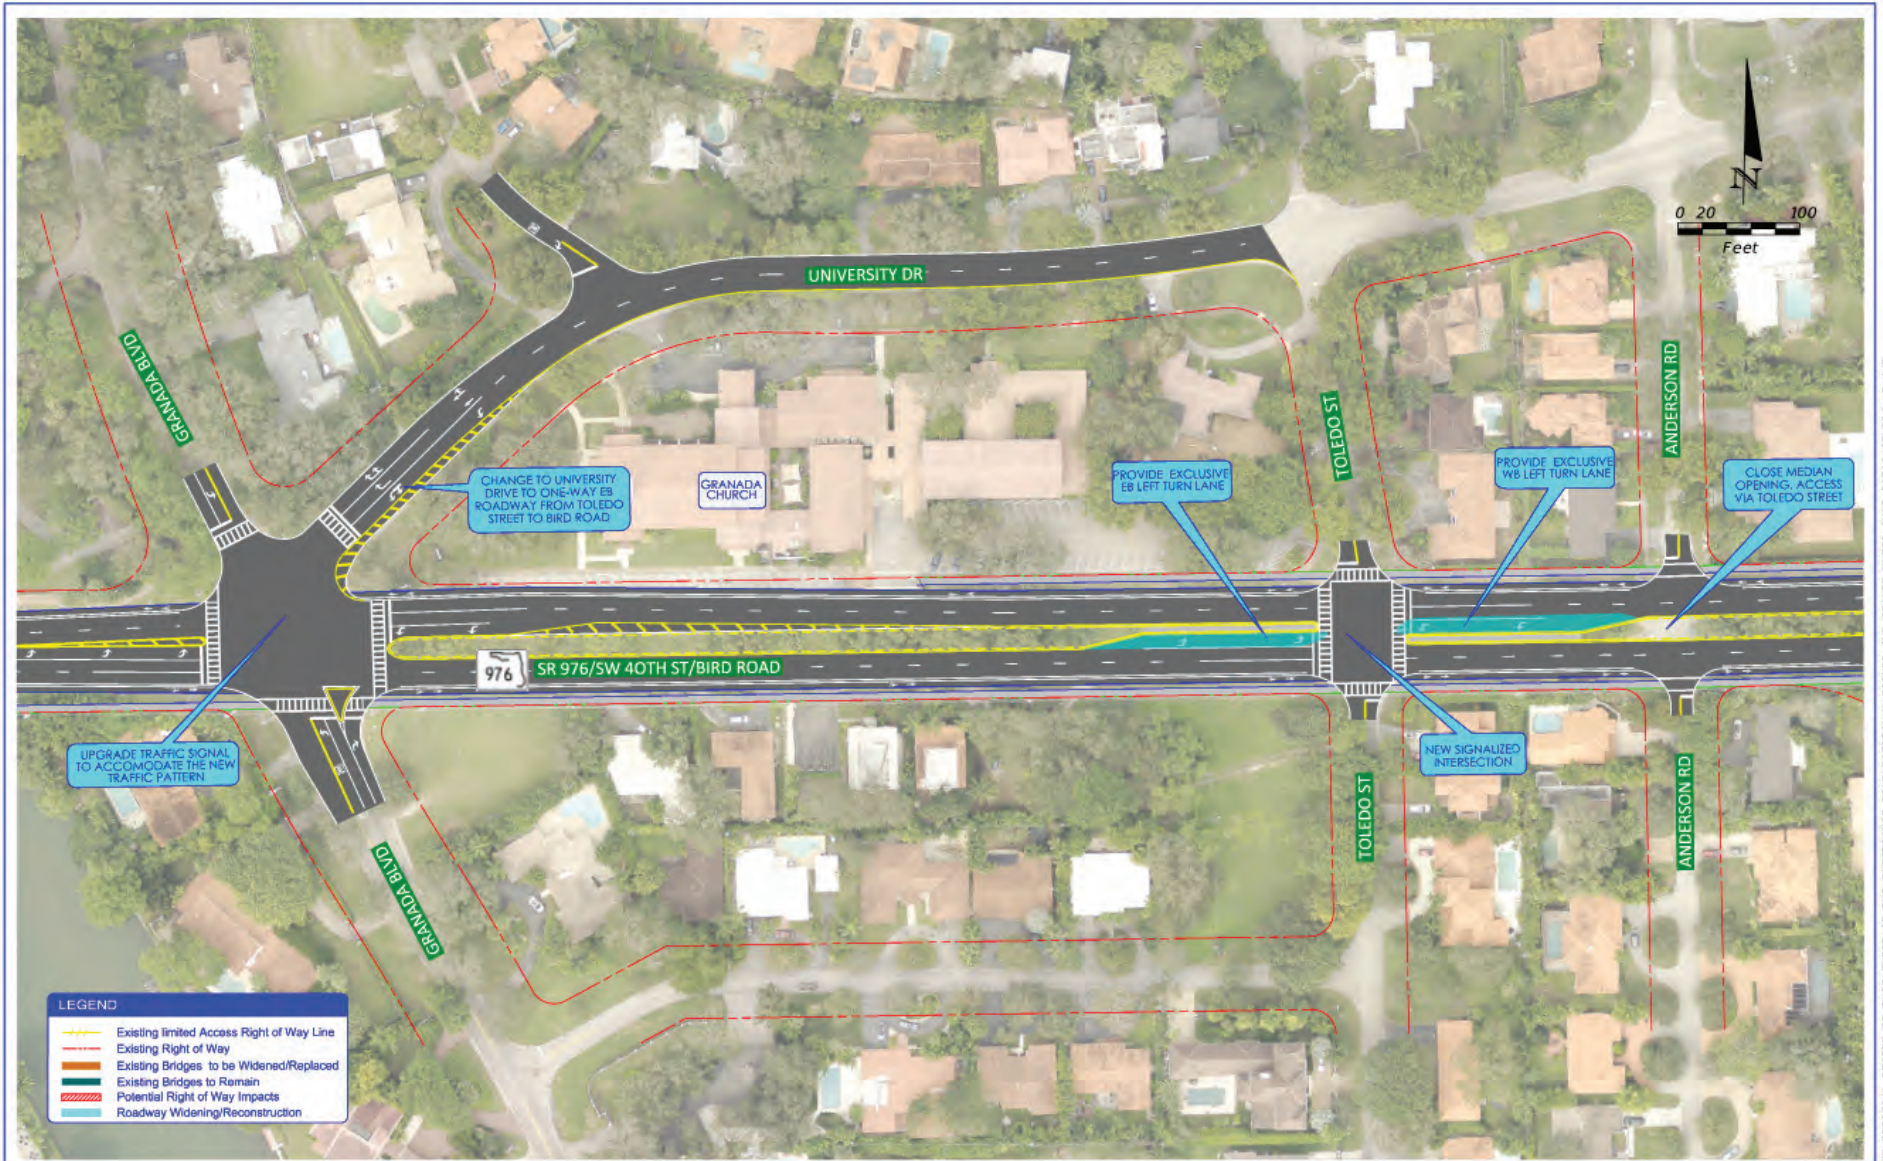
Bird Road Improvement Recommendations – University Drive Detail
